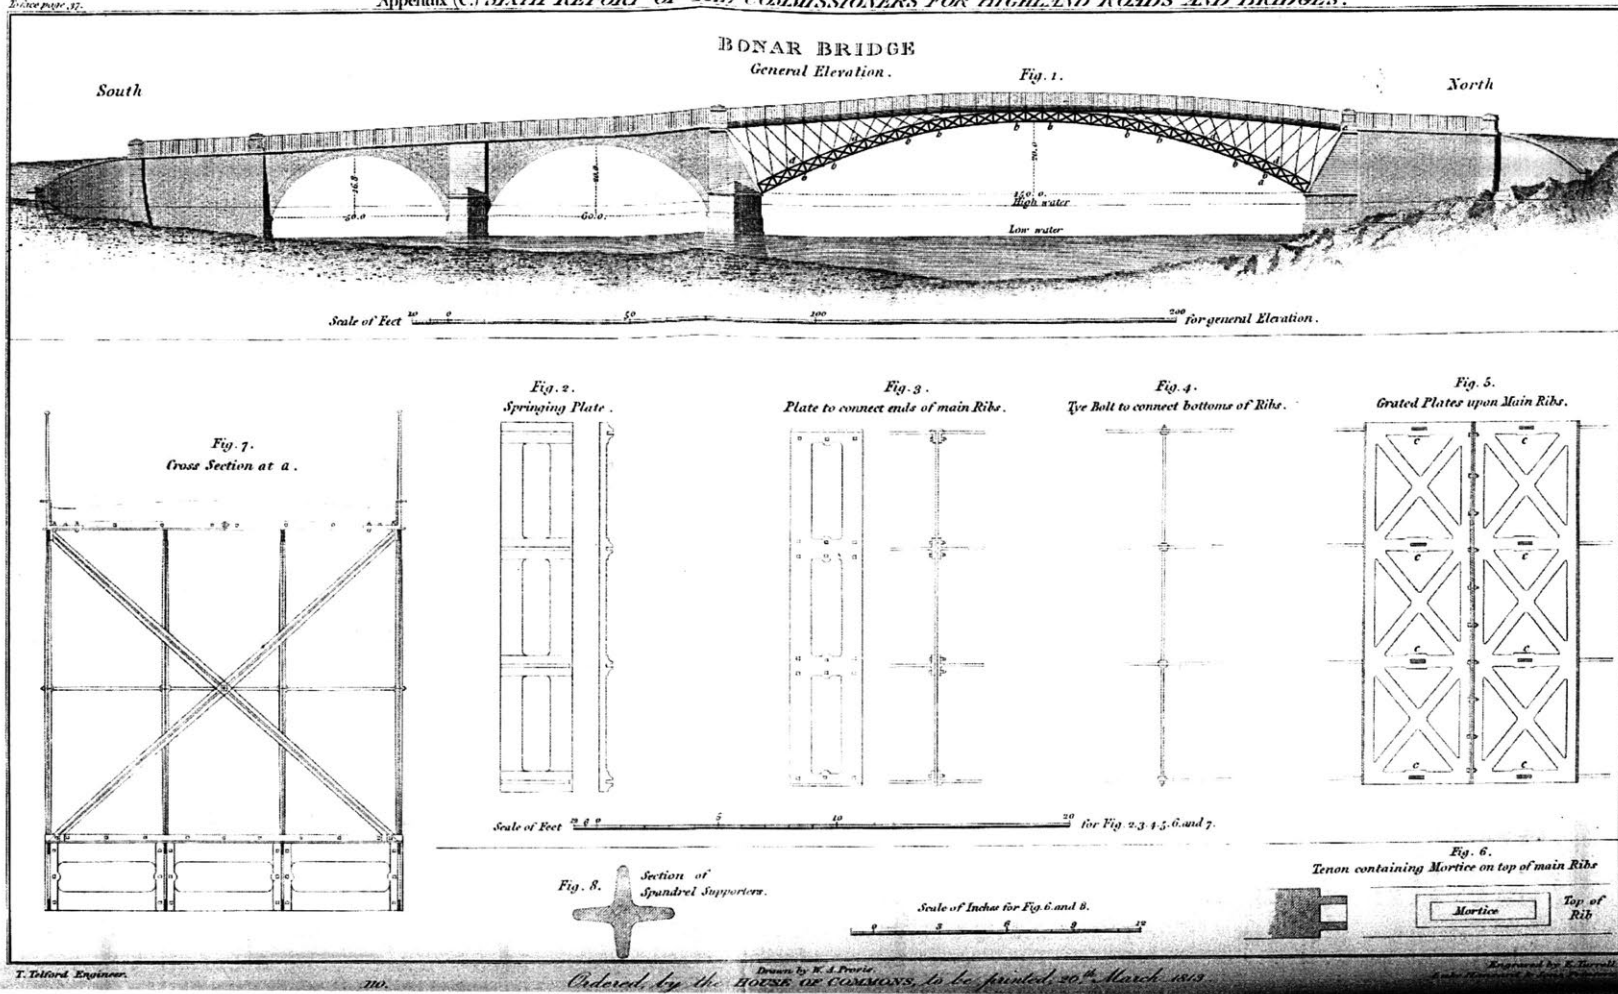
Elevation, sections, and details for Bonar Bridge (Sixth Report of the Commissioners for Highland Roads and Bridges 1813)
